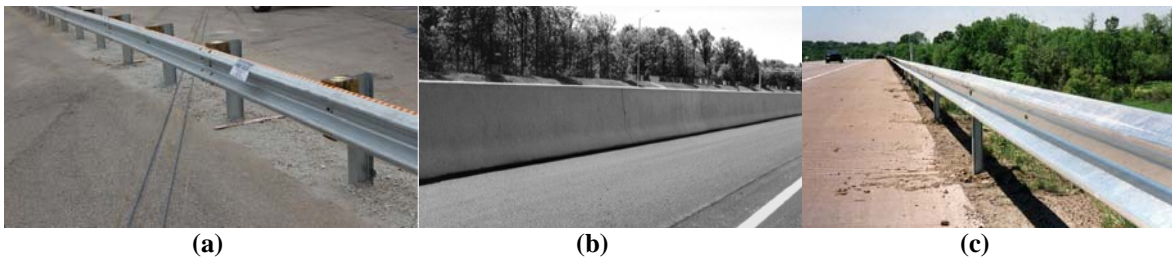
Barrier Types: (a) Strong Post W-Beam Barrier (b) Concrete Barrier (c) Weak Post W-Beam Barrier
